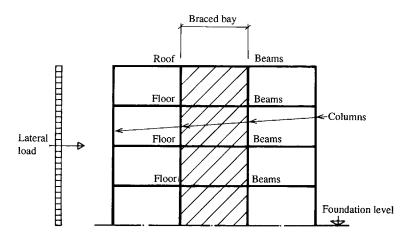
Braced frame; lateral load transmitted down to foundations through a system of bracing or shear walls
